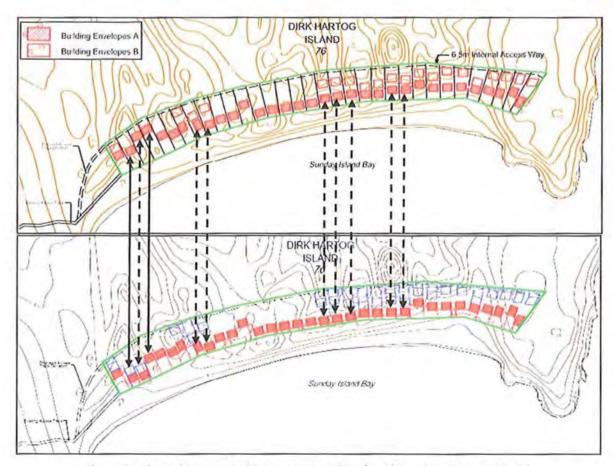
Altered Layouts with New Layout (Top) and Previous Layout (Base)
